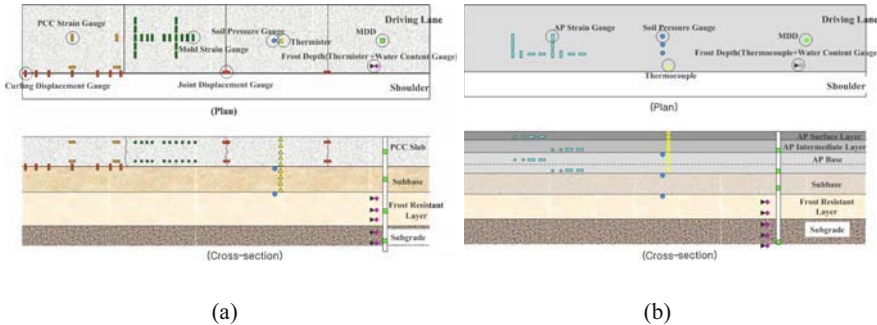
Location of the sensors installed in the test-road: (a) Concrete pavement section; (b) Asphalt pavement section
